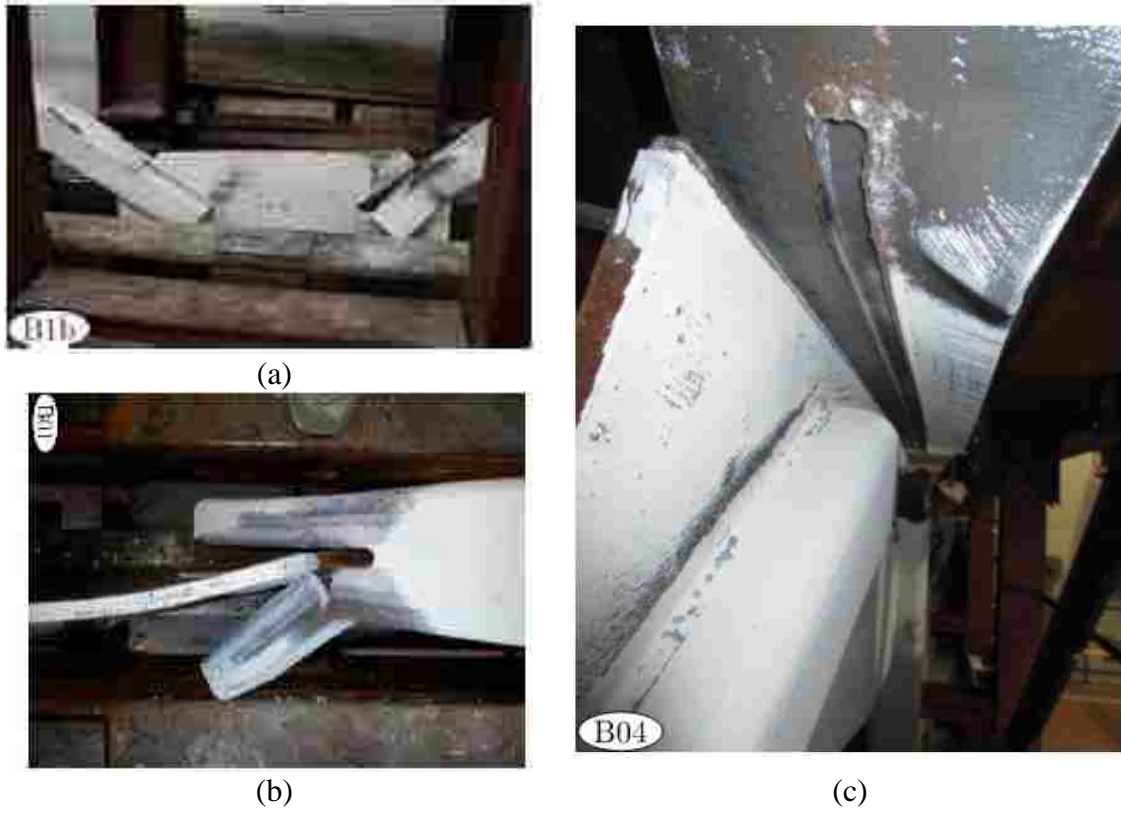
Weld fracture during the test: (a)&(b) fracture of story 1 upper mid span brace gusset connection; fracture of story 1 bottom mid span beam gusset connection (Bradley et al. 2015)
